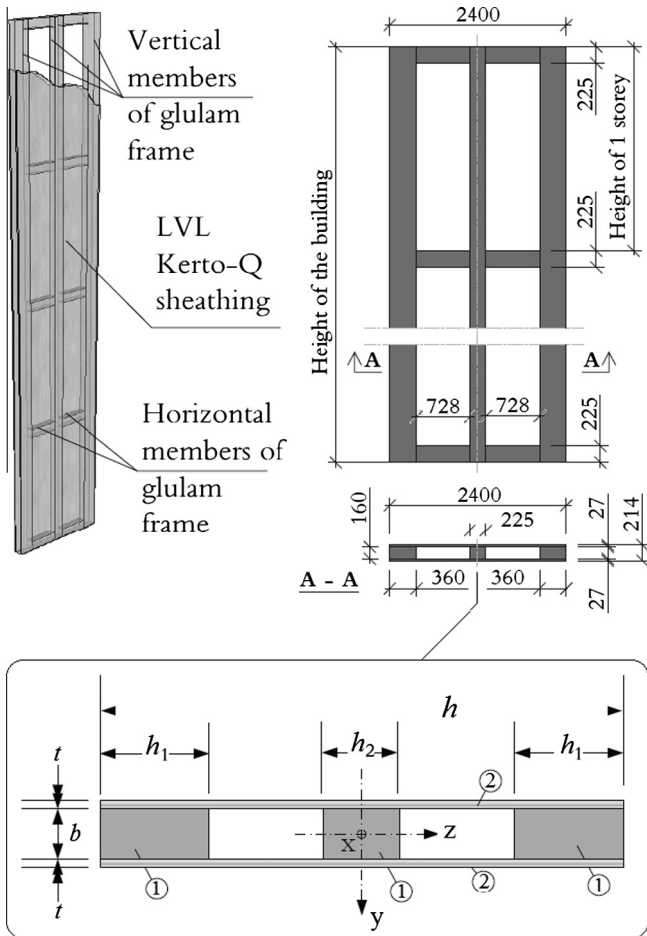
Configuration and cross-section of the Trä8 composite stabilising wall element.
